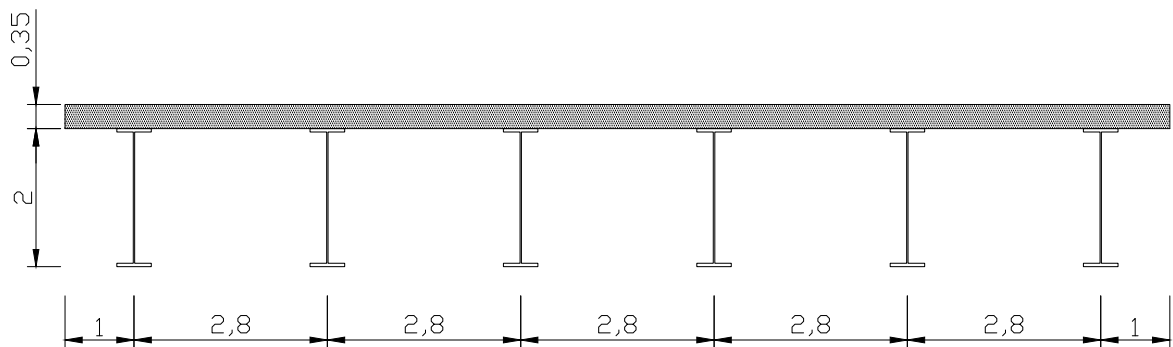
Schematic cross section of the multi-girder beam bridge [m]
